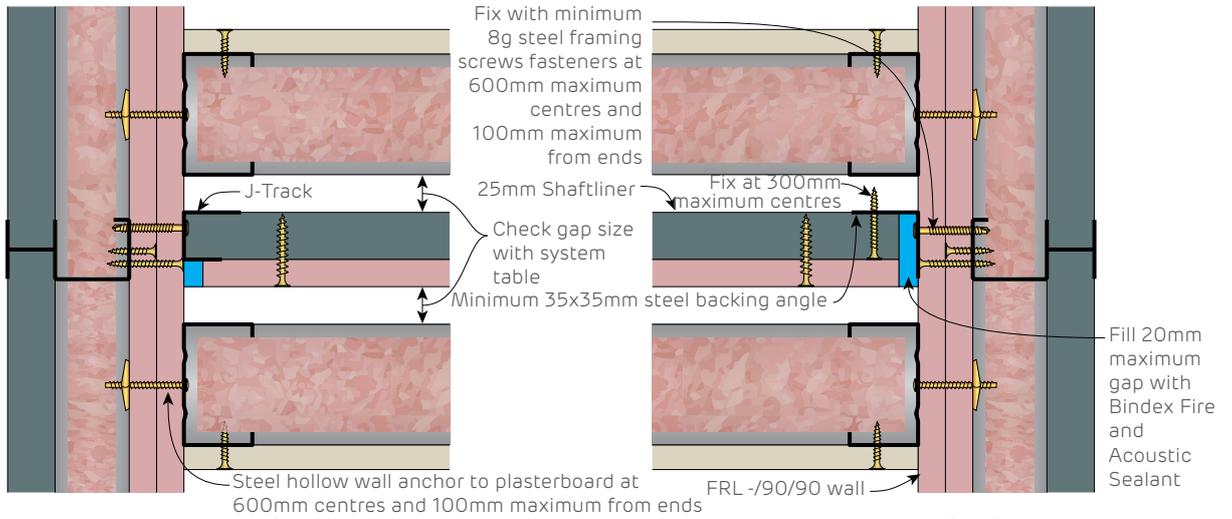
Interhome Highrise Wall to Shaft Wall
